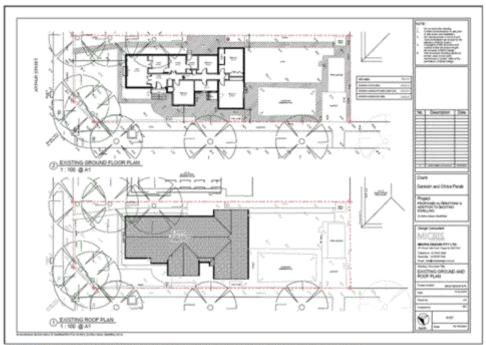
Existing ground and roof plans (received by Heritage 21 on 11 September 2020).
